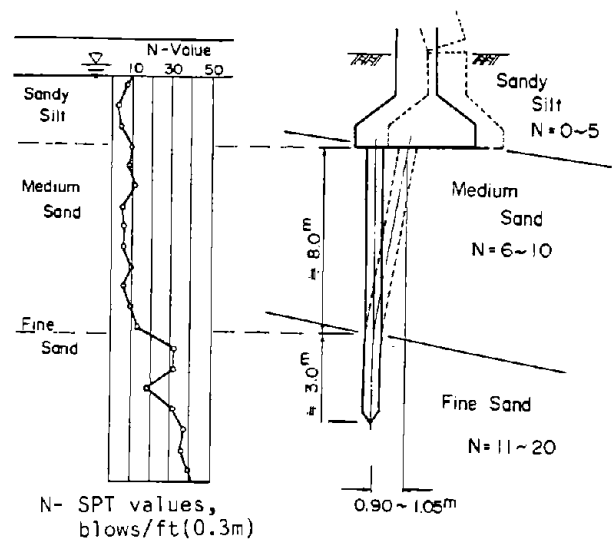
Damage to a Foundation Pile of Yachiyo Bridge(P₂)⁷⁾
